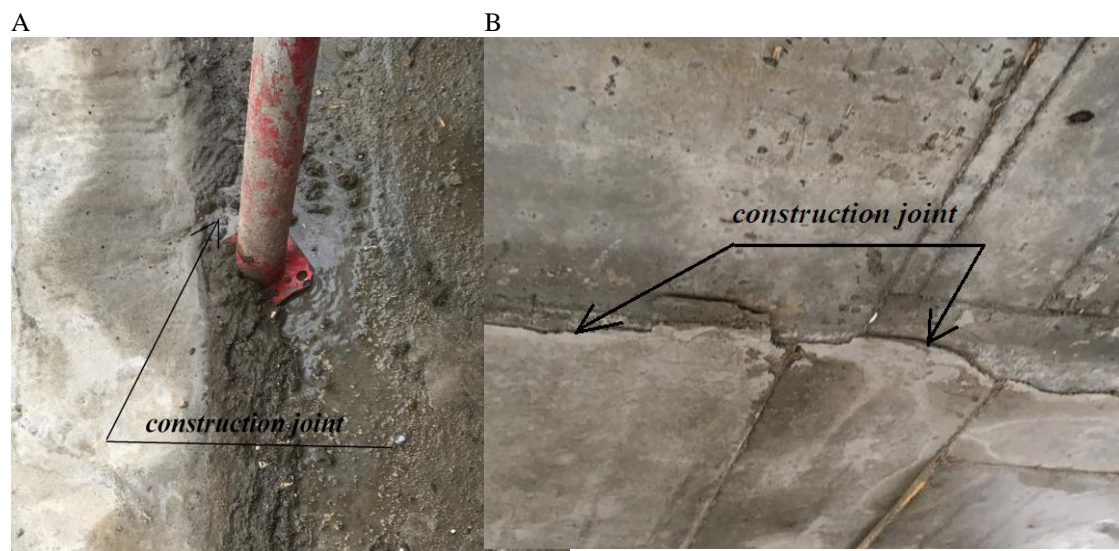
A. Construction joint, top of slab, B. Construction joint, bottom of slab
